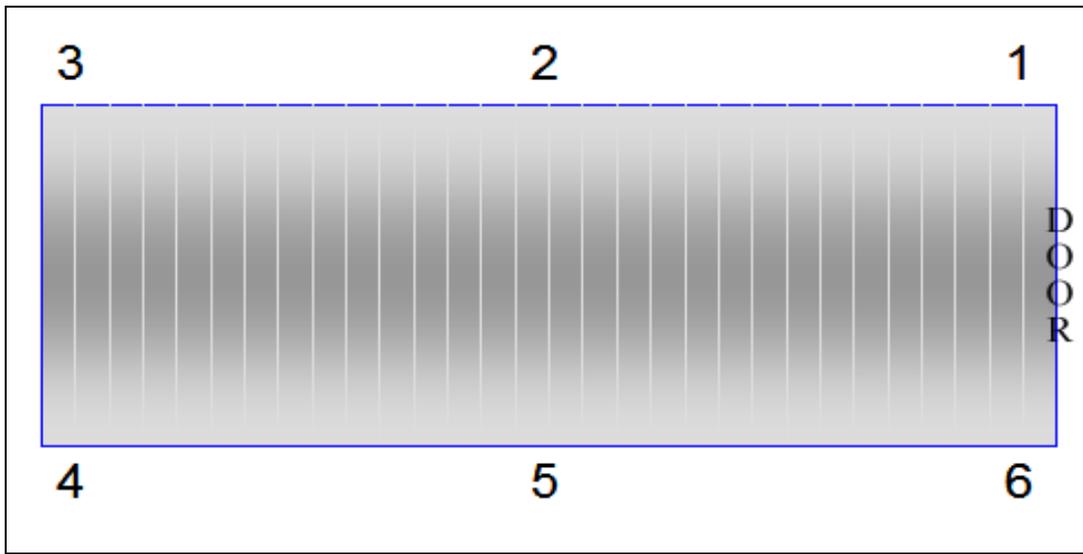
Drawing indicating electrical potential measurement locations on steel arch ceiling of magazine.
